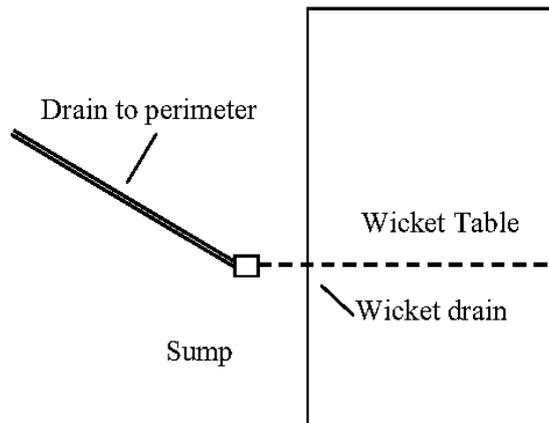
Sump to be located on the side of the wicket table to connect the wicket drainage to the stormwater pipe.
